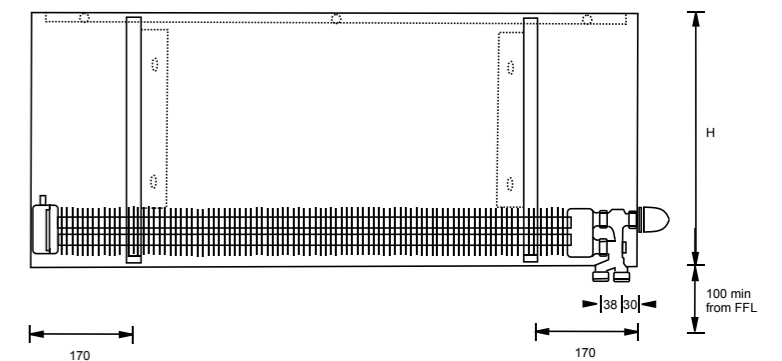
Sentry dimensions in mm, including pipe centres for Herz 2-pipe system valve.
